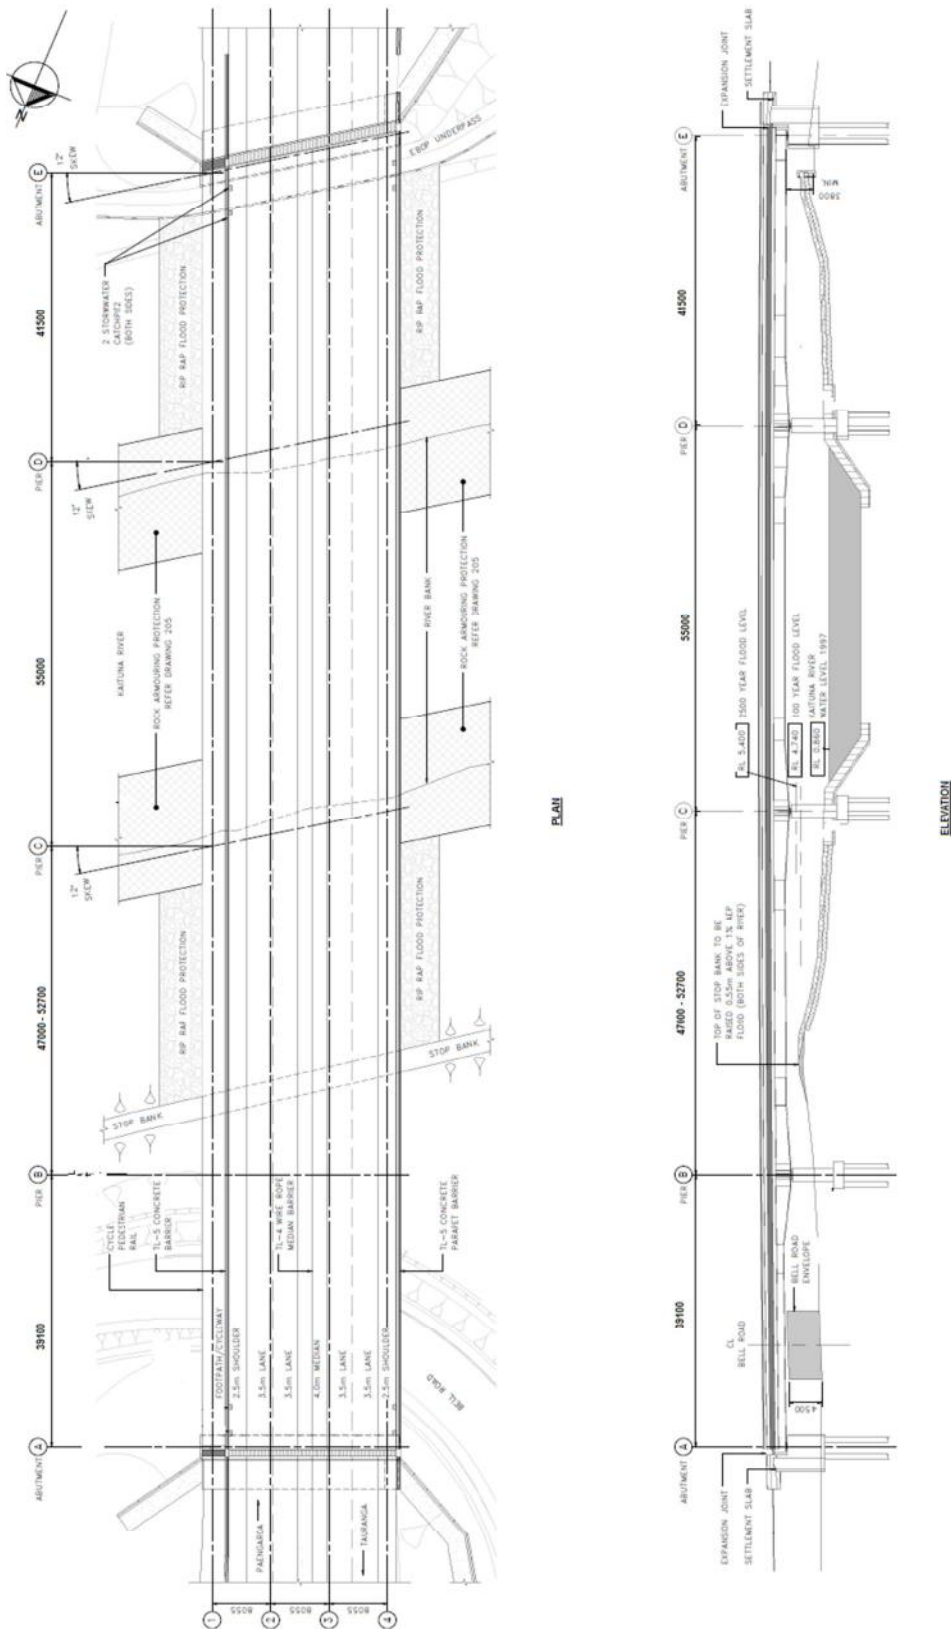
Final Plan and Elevation of the Kaituna River Bridge.
